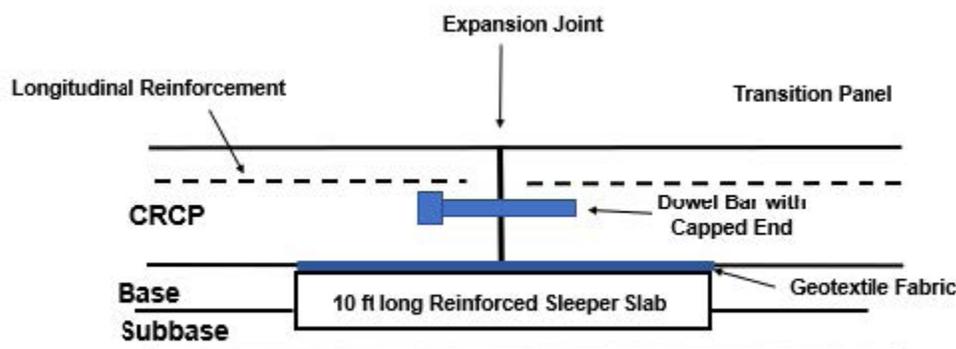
Diagram. CRCP terminal design adjacent to a bridge approach slab.
